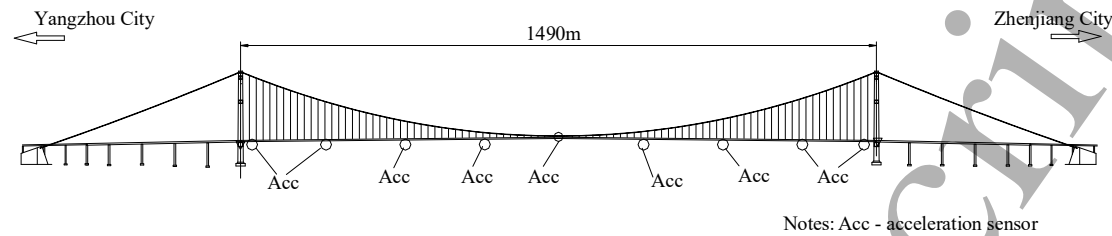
Arrangement of Acceleration Sensors for Runyang Bridge
